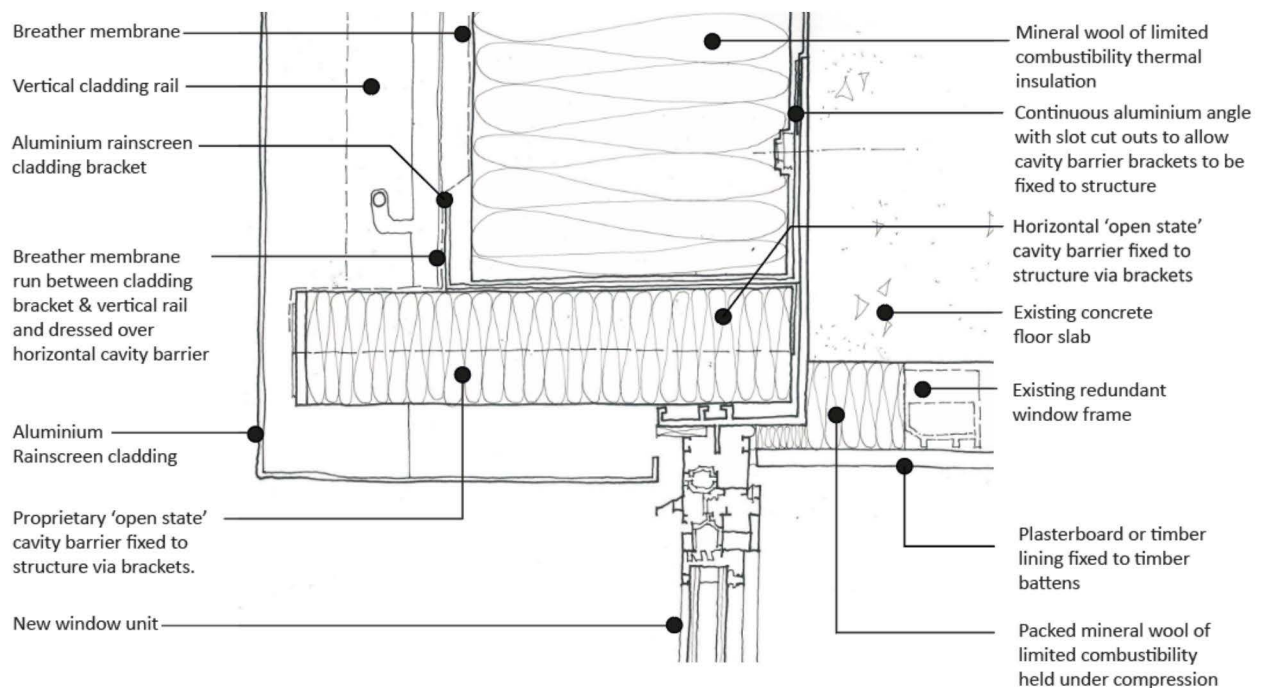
Typical Detail 2 – Sill detail with cavity barrier arrangement highlighted
